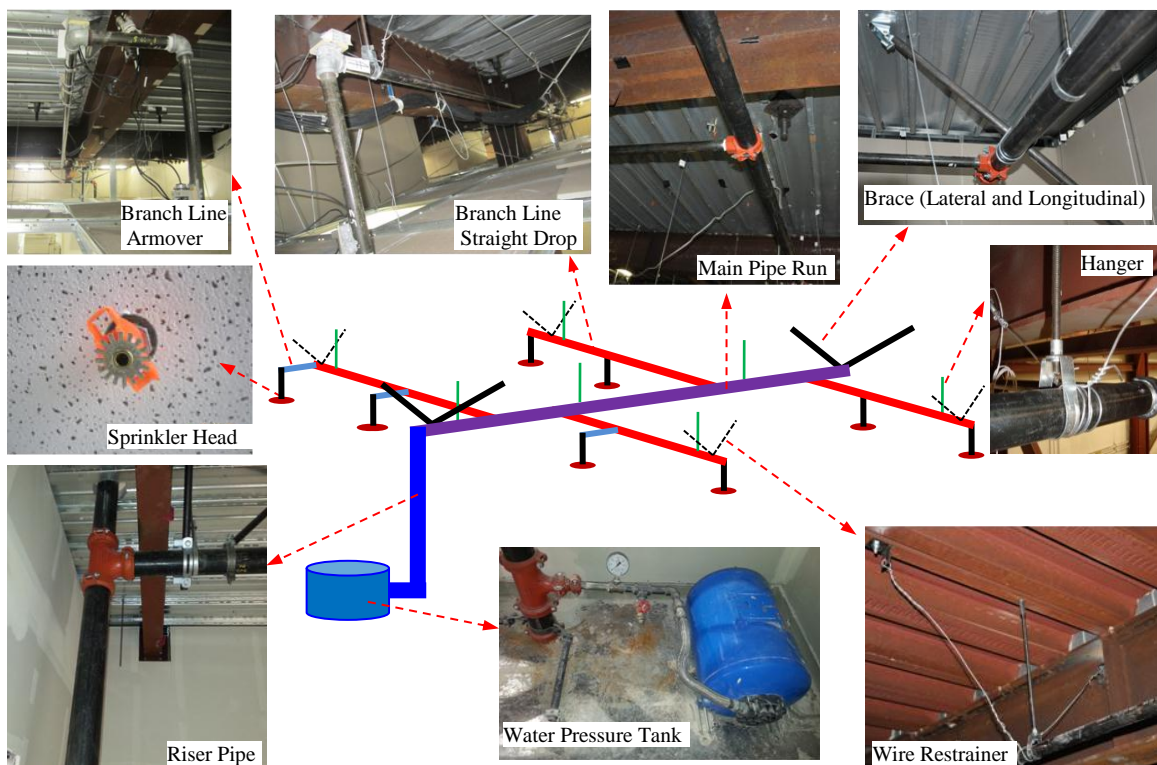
Fire Sprinkler Piping System Schematic, Source: (Soroushian et al., 2014b)
